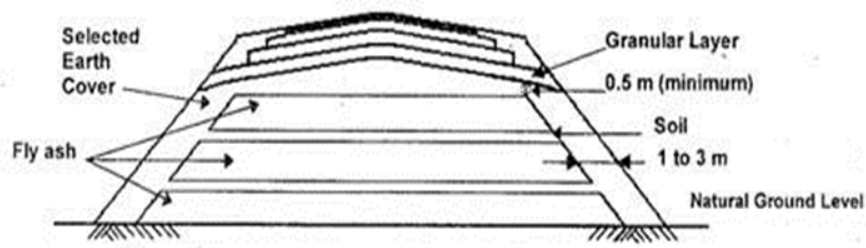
Typical Cross-Section of Embankment with Alternate Layer of Fly Ash and Soil
